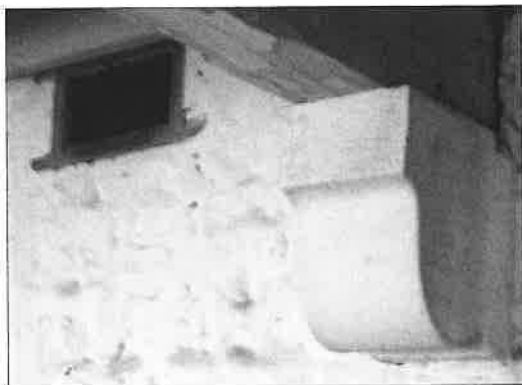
Typical Wilkinson ventilation box under Borrisokane workhouse ceiling rafters
